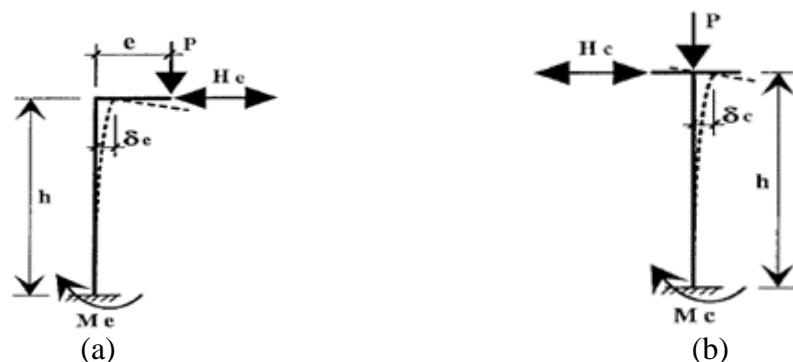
(a) Eccentrically Loaded Column; (b) Centrally Loaded Column
